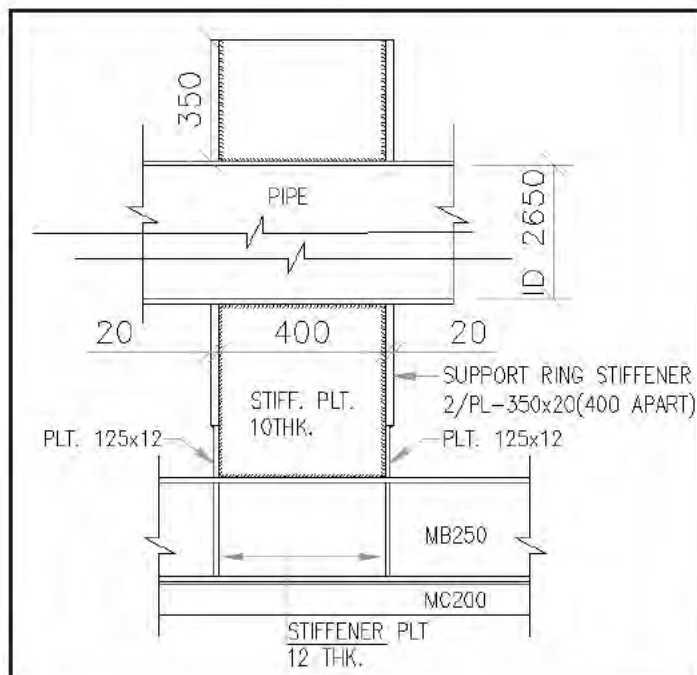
Side Elevation of Beam B2 Supporting Pile at Support
